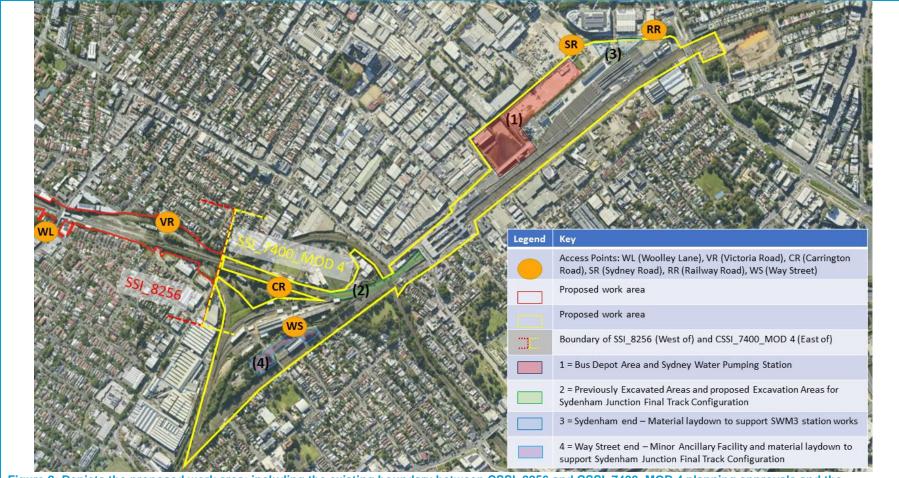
Depicts the proposed work area; including the existing boundary between CSSI\_8256 and CSSI\_7400\_MOD 4 planning approvals and the proposed access points. Note: *Track slab involves installation of platforms and key elements of the Metro, at the platform level for the operation of the Metro line. Whereas Track Re-conditioning involves the restoration of existing track.* Area 1 (the Temporary Marrickville Bus Depot Area and Sydney Water Pumping Station) is excluded from the proposed change
